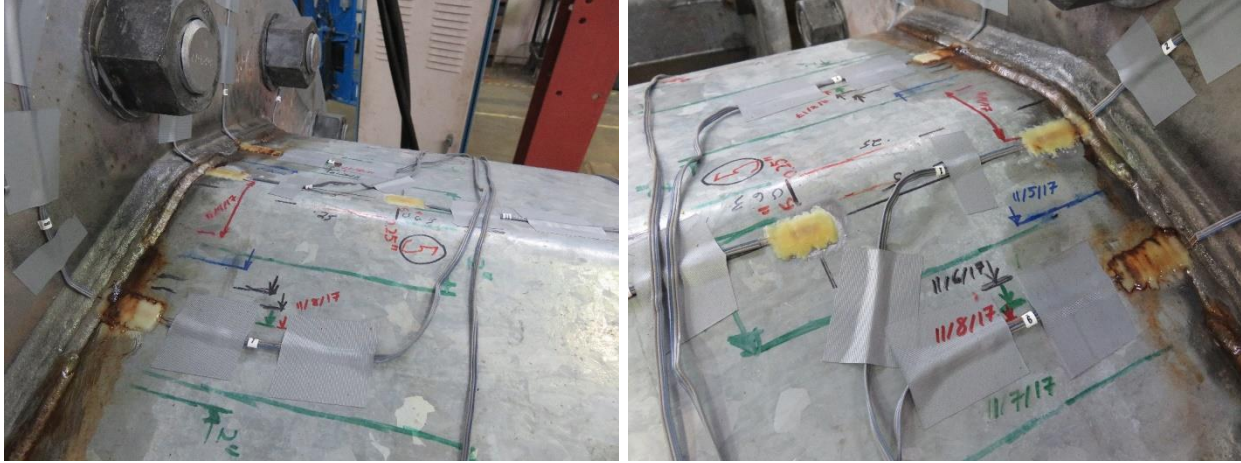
Weld-Repaired Specimen 33-3-12-TX-A2 – Bend 5 Following the Fatigue Test: General View
